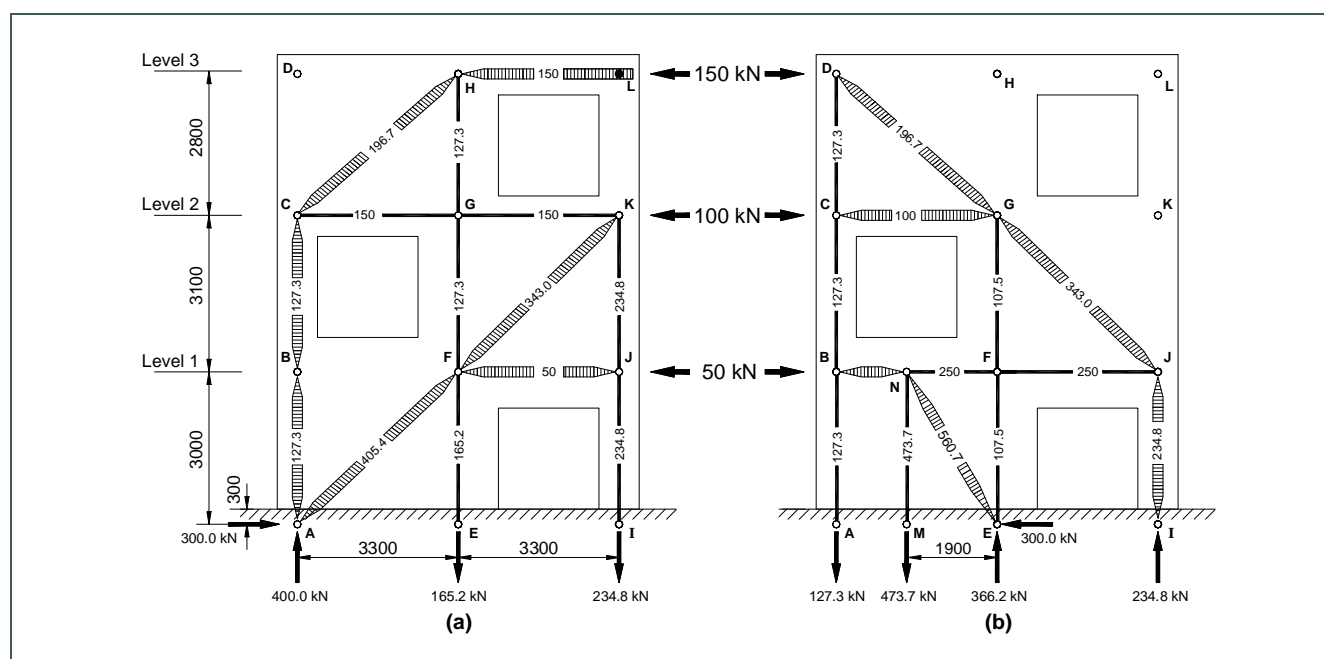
Strut-and-Tie Models for Masonry Wall (seismic loading only)
